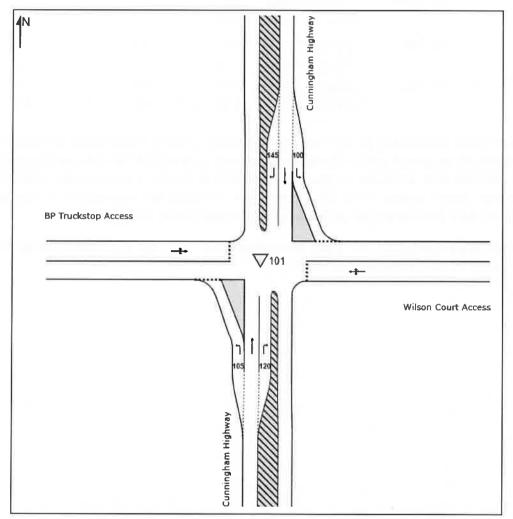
Cunningham Highway / Wilson Court Access Intersection SIDRA Layout
